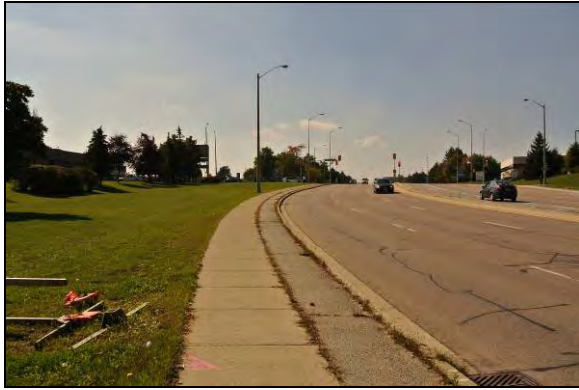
View south towards the intersection of Derry Road and Argentia Road
